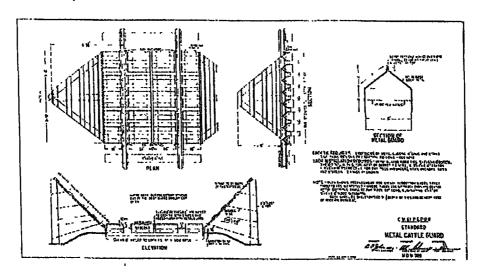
Standard Milwaukee Road cattle guard (author's collection).
